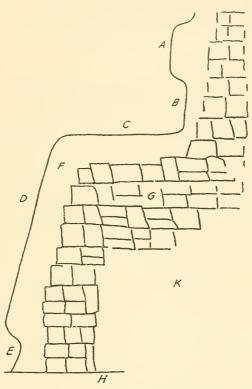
Mound 9. Section through lower wall. a, Upper cornice. b, Recess. c, Ledge on which vessels were found. d, Sloping wall. e, Lower recess. f, Thick stucco layer covering wall. g, Cut-stone masonry. h, Stucco floor. k, Mound structure.
